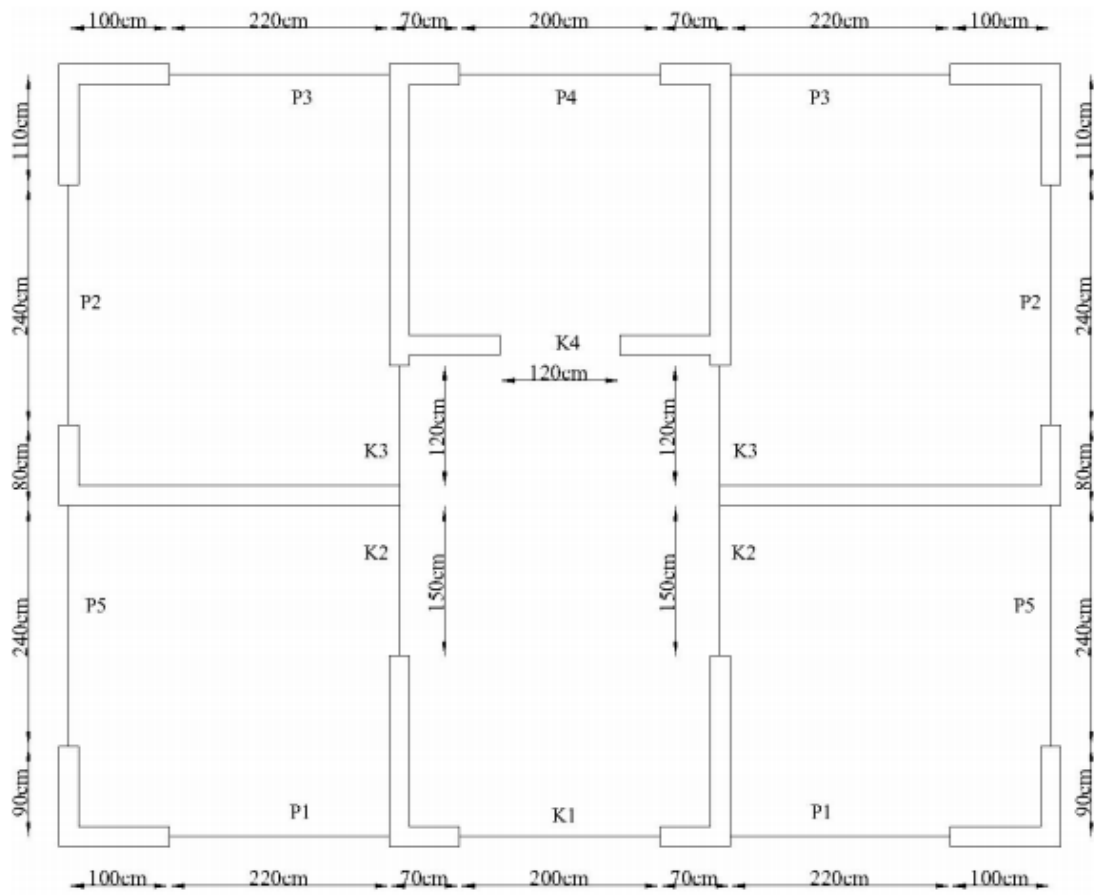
1. Plan geometry of subclass R1W3 of masonry building model
